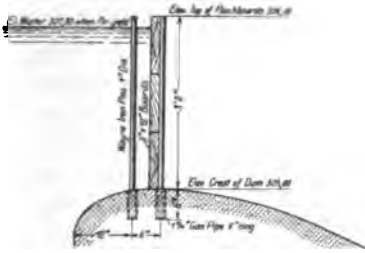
, shows the details of flashboard construction in connection with the Las Vegas dam, and fig. 119 gives the flashboard details of the Schaghticoke dam.
